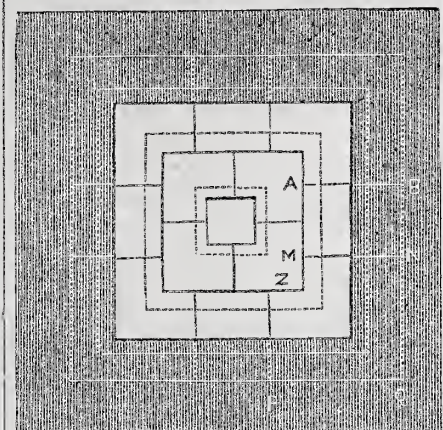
Plan of a Flat Vault, Covering a Square Hall, Supported by Four Walls.
